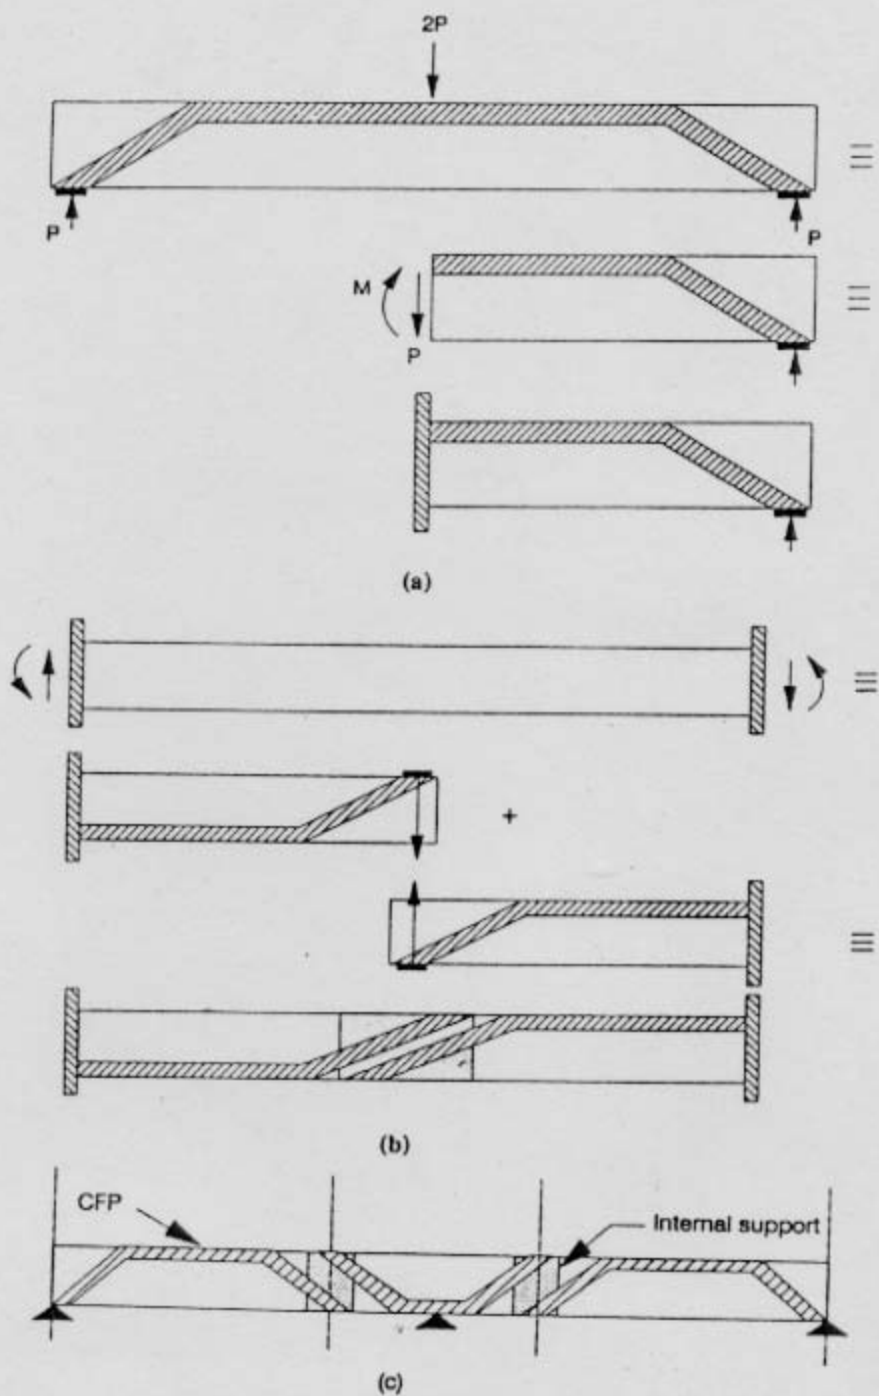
Proposed Model for (a) Cantilever Beam, (b) Coupling Beam, and (c) Two-Span Continuous Beam
